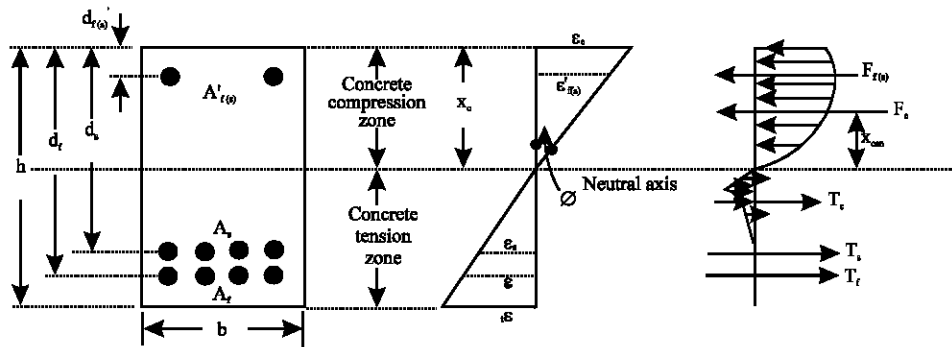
Hybrid FRP and steel reinforcing concrete section stress, strain distribution and forces: a) Hybrid reinforcing concrete section; b) Strain division and c) Stress division and forces
